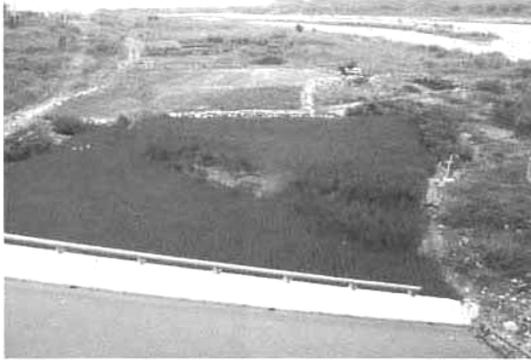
Evidence of fault crossing the Wu-shi bridge
